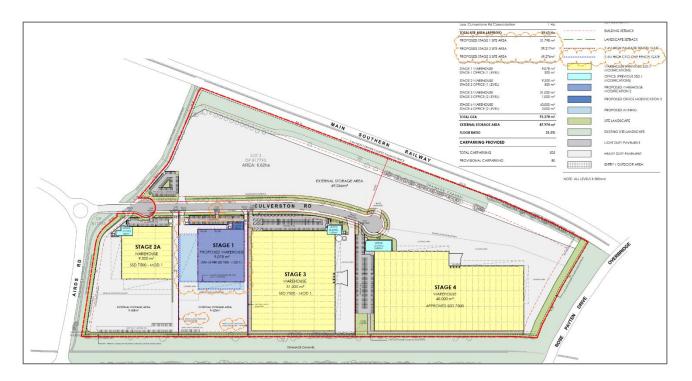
SSD-7500-Mod-2 Architectural Site Plan (drawing CH2CUL - A - 04, revision A, by Watch This Space Design, dated 03/02/2022)
